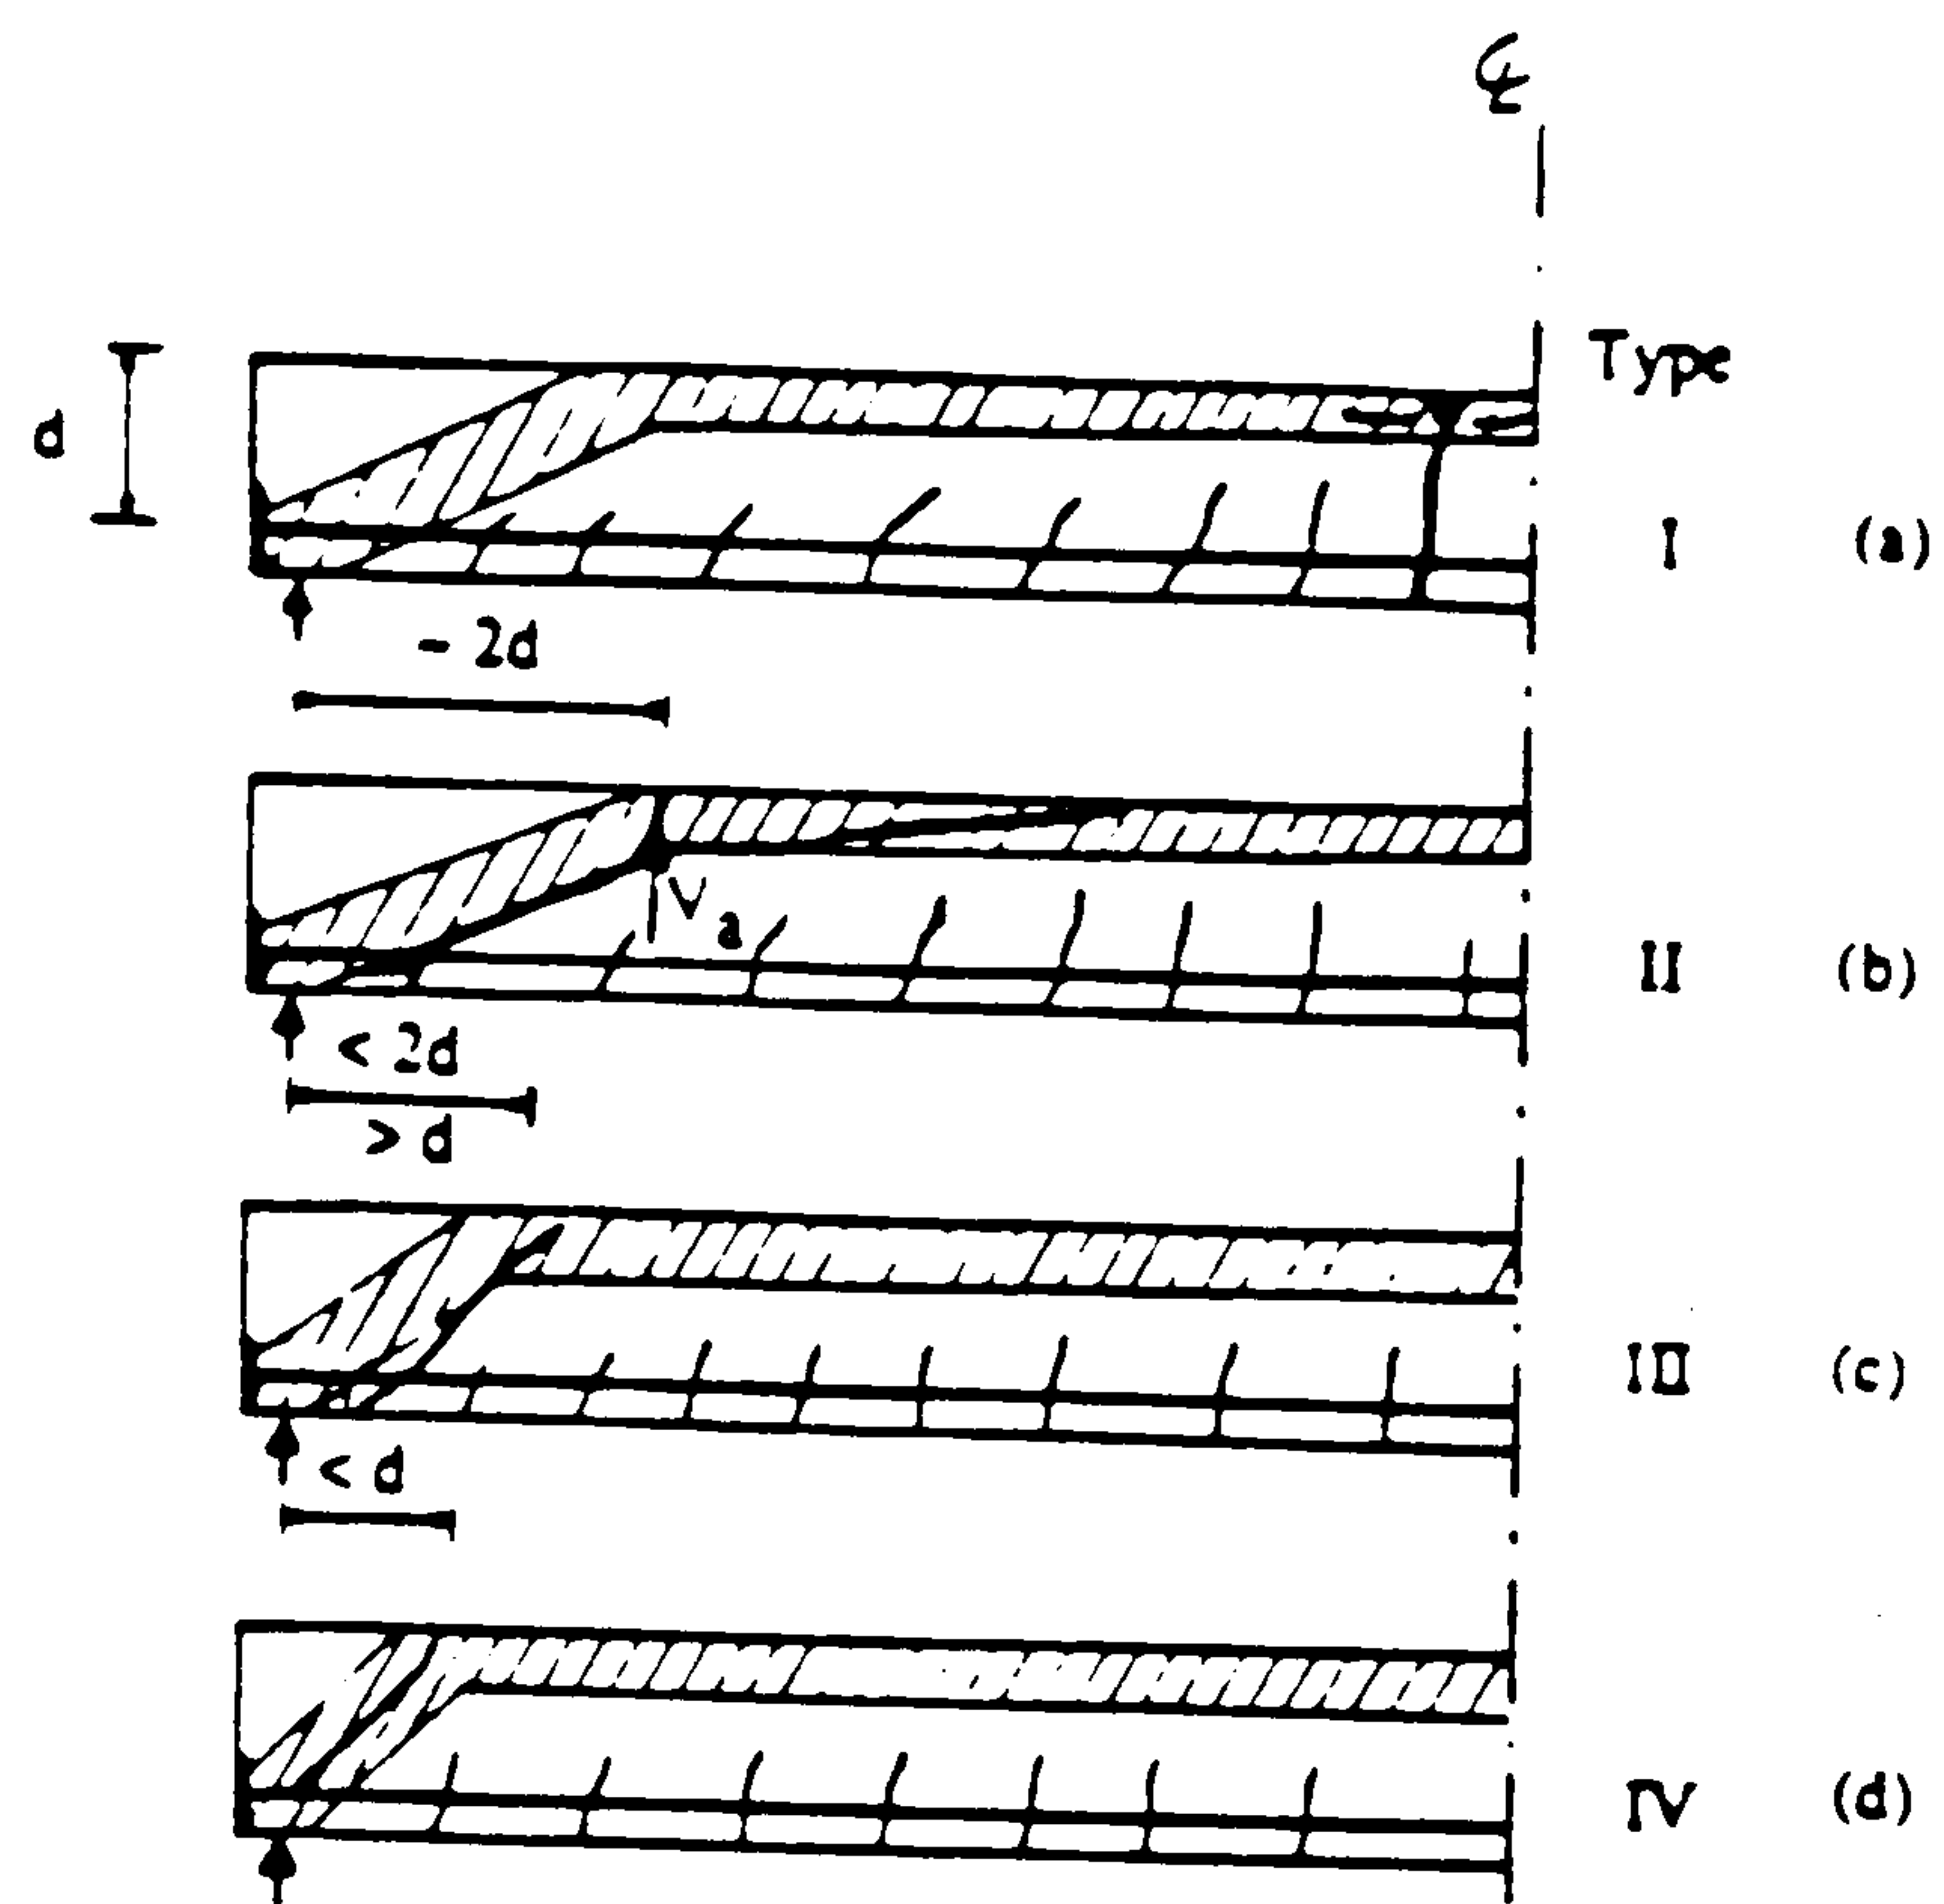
Typical types of behaviour exhibited by reinforced concrete beams without shear reinforcement. Kotsovos [60]
